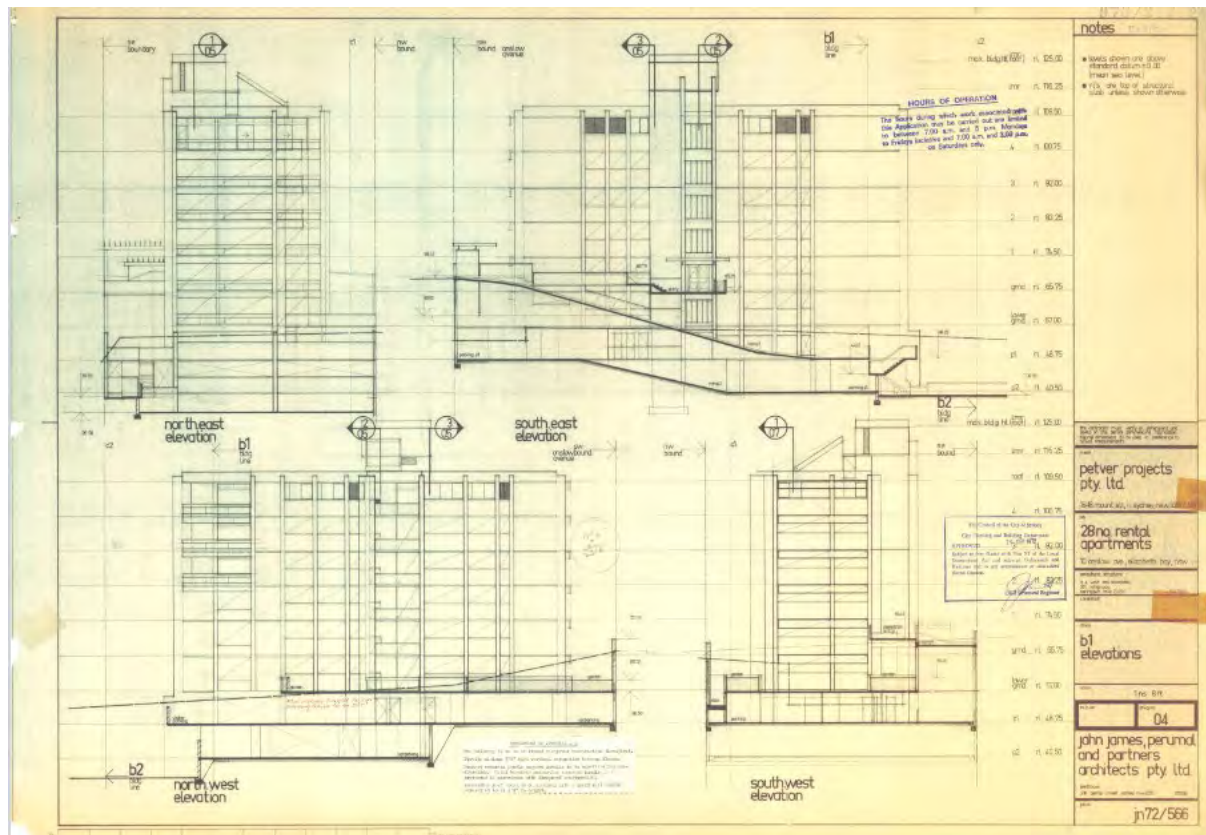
Submitted architectural drawings, Building 1, elevations, 1972. (Source: City of Sydney Archives, A-00590018)
